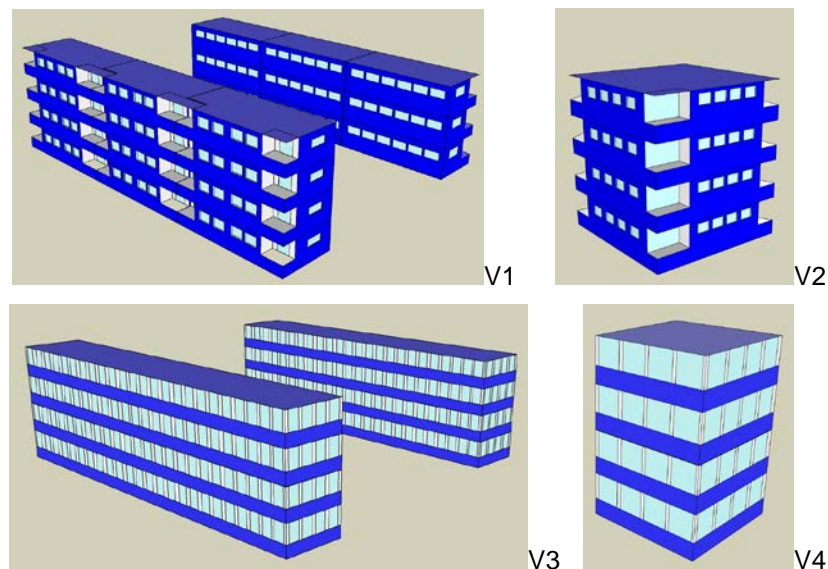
Façade layout for the four basic building variants for an example of four floors each. The roof and the façade surfaces colored in dark blue host PV.
